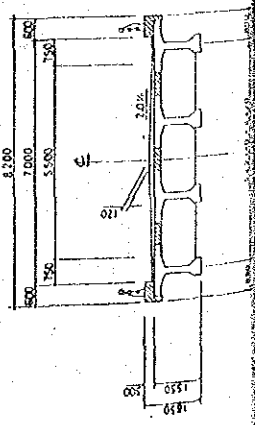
MAIN FEATURES OF PROPOSED BRIDGE ON THE WALAWE RIVER
